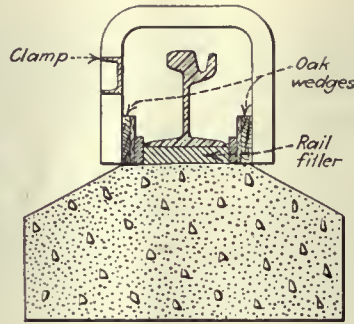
As the screw clamps are removed, U-shaped clamps with oak wedges are substituted
